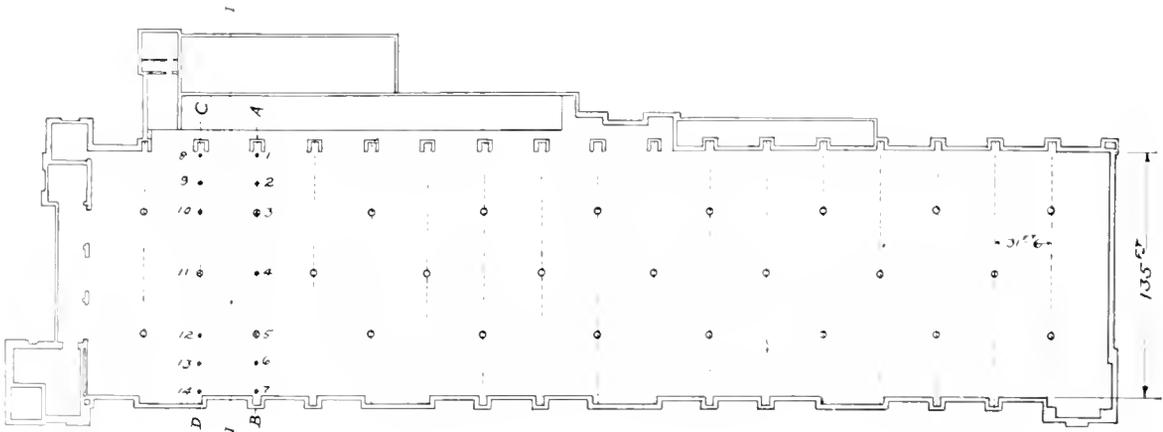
a. Sectional Plan Showing Location of Lamps in Riding Hall at the West Point Military Academy
